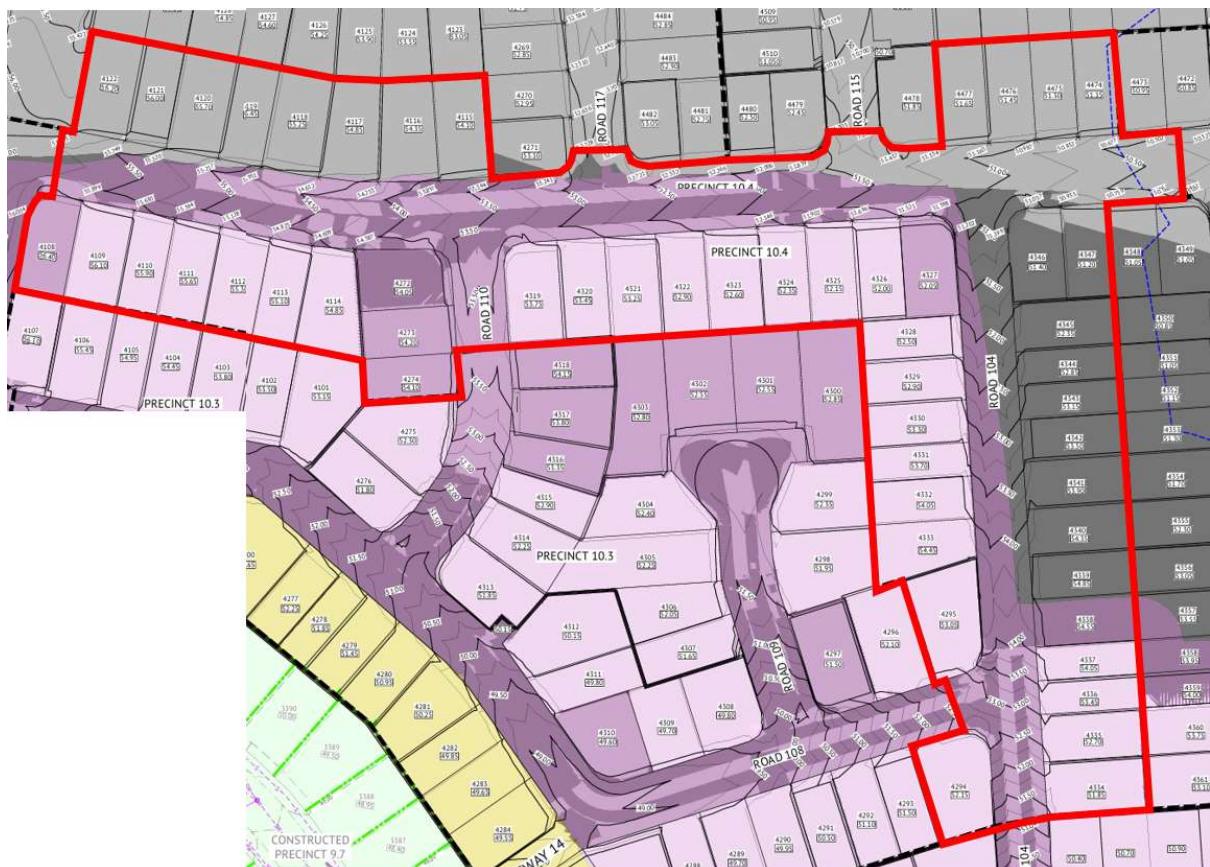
Actual Constructed Area of Fill (600mm BFSL) – Shadforth Survey Plans
